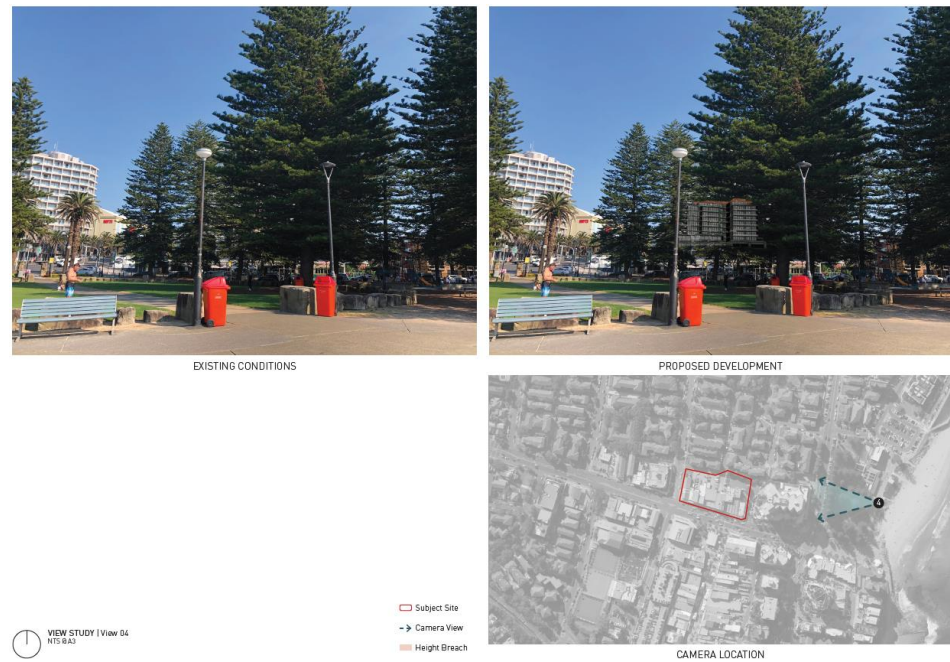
View from North Cronulla Beach, across Dunningham Park, looking west towards the subject site. (Source: PBD Architects).
